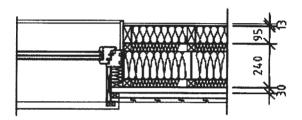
Window detailed passive-wooden wall with frame insulation (wall type 3)
